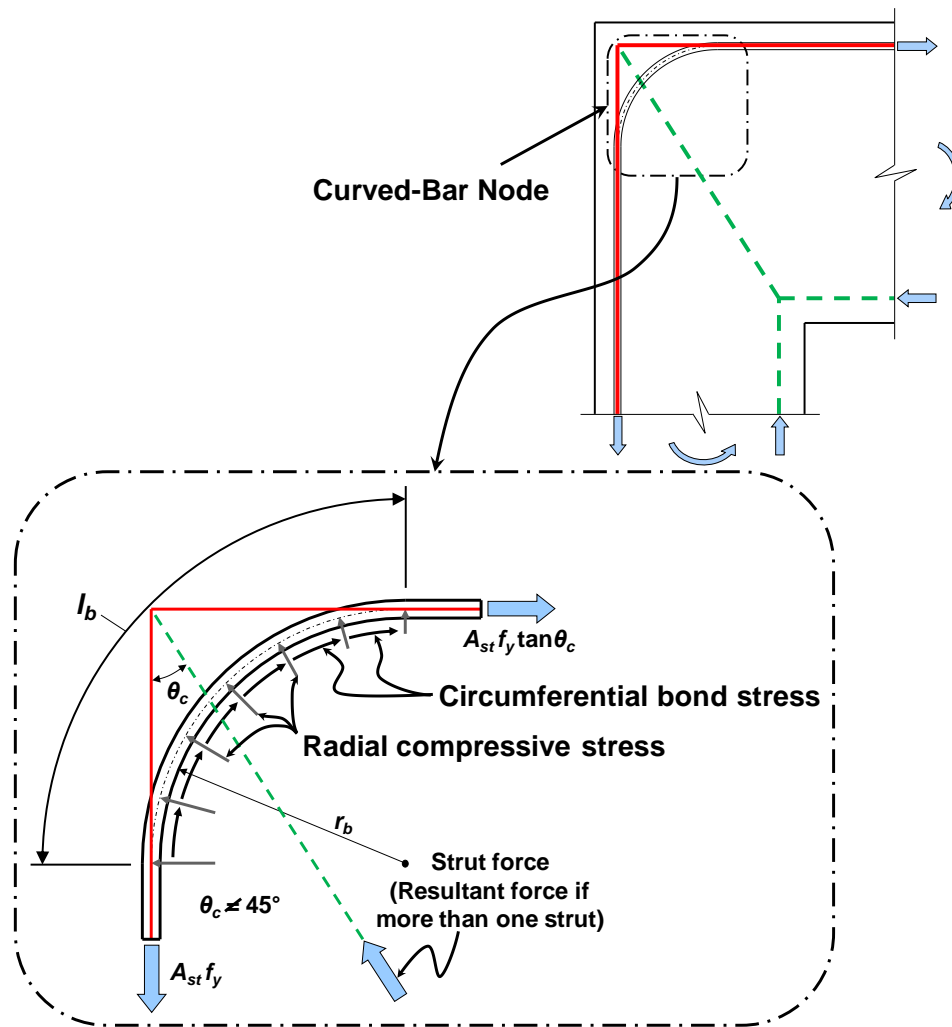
Stresses acting at a curved bar (adapted from Klein, 2008)
